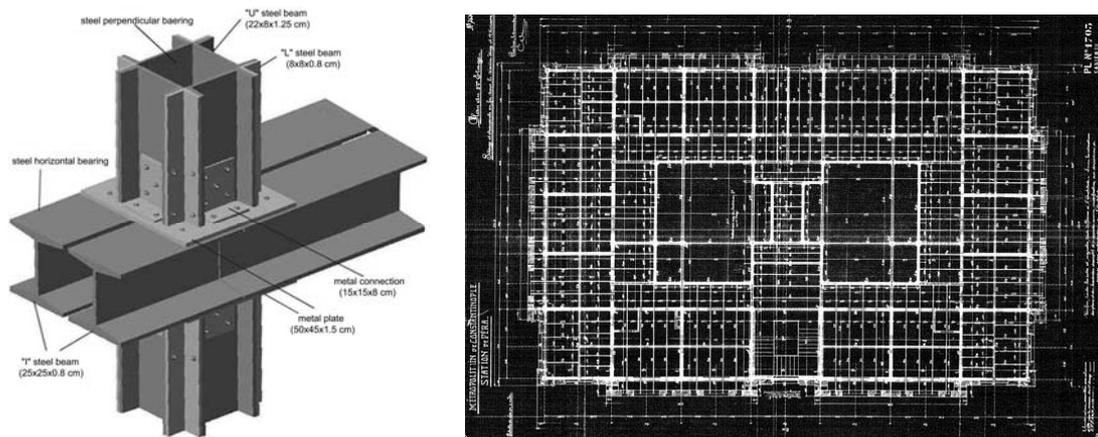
Steel framework construction technology, vertical and horizontal bearer (U. Yergün). Floor Project, Metro Khan (1913), one of the first buildings with steel framework structure (İETT archives).
